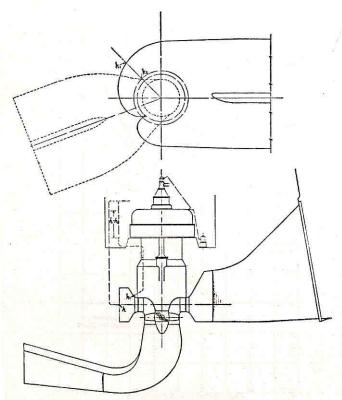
GENERAL ARRANGEMENT OF ADJUSTABLE-BLADE PROPELLER TURBINE SHOWING LOCATION OF WINTER-KENNEDY PIEZOMETERS
